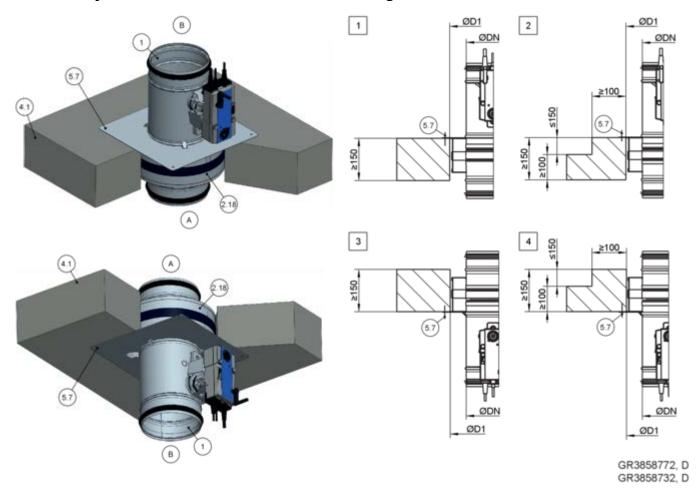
Dry mortarless installation with installation block ER in solid ceiling slab, upright and suspended
